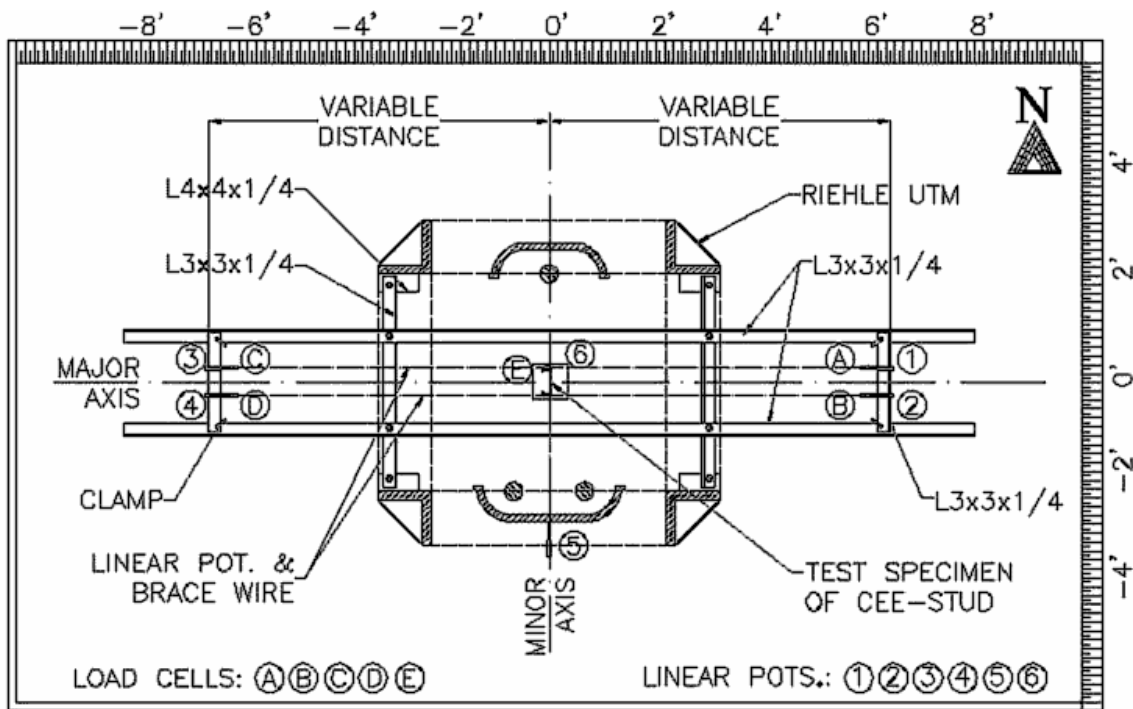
Plan View of Single Column Axial Test Setup in the Riehle Universal Testing Machine
